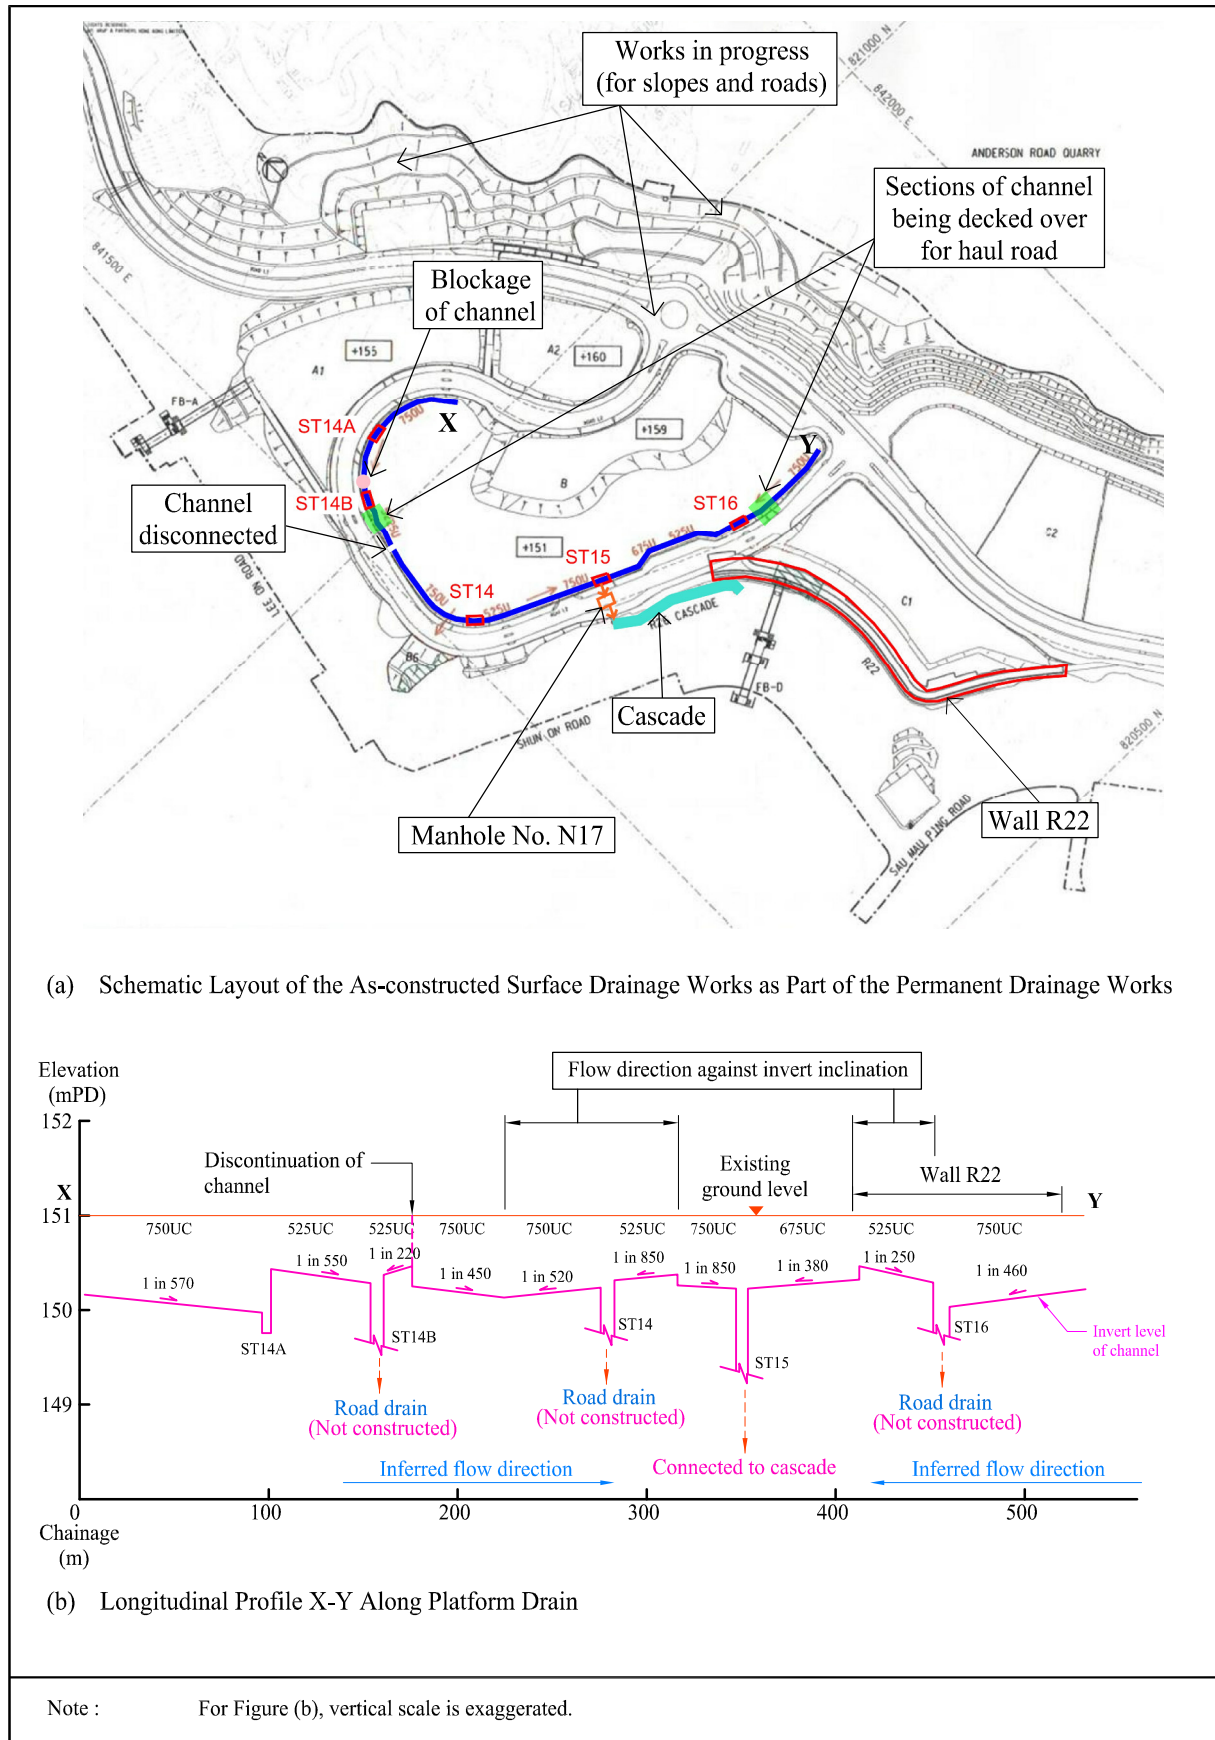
Schematic Layout of As-constructed Surface Drainage System at Platform B
